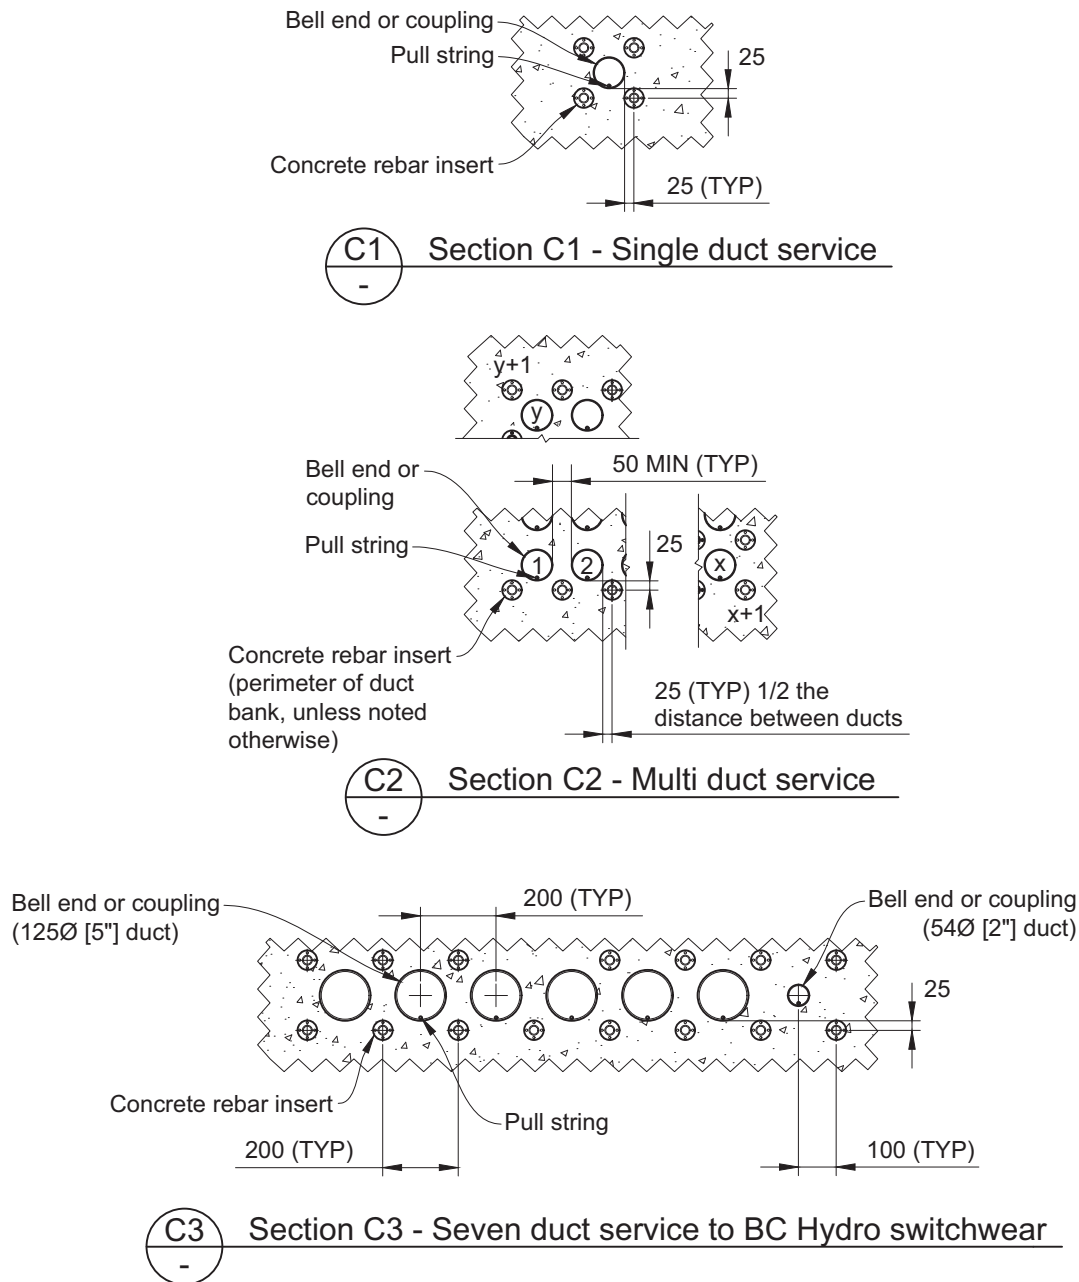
Concrete rebar inserts for BC Hydro service ducts to zero property line buildings
